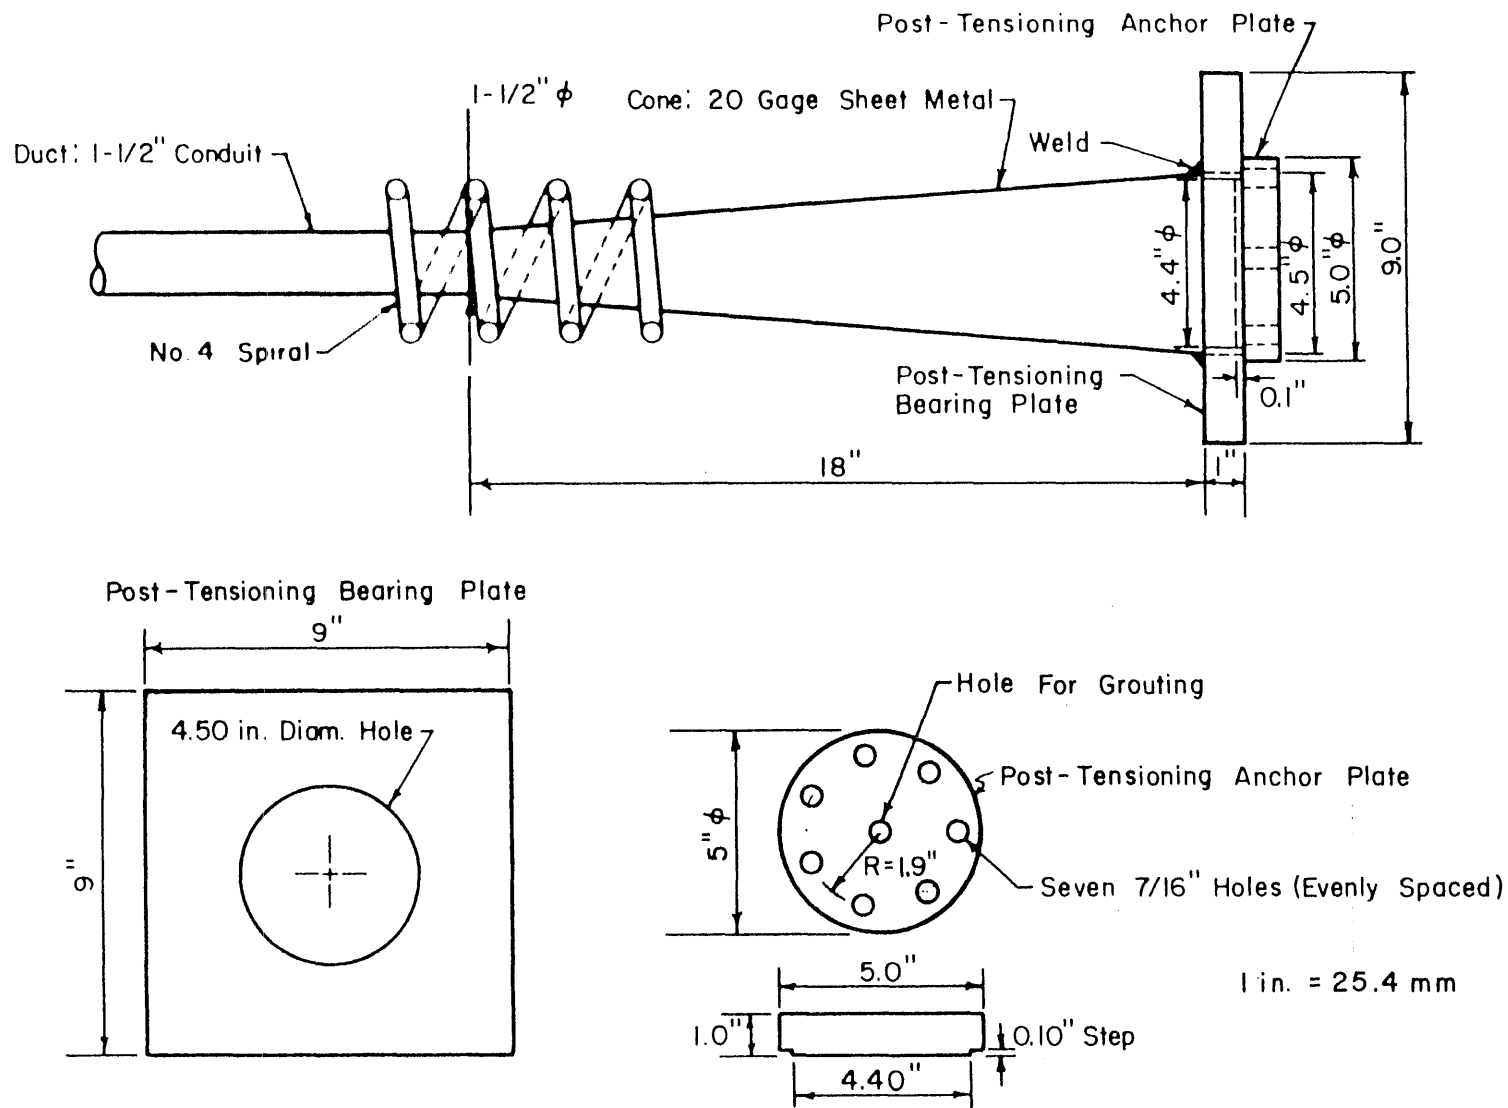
DETAILS OF POST-TENSIONING ANCHOR PLATES AND DUCT TRANSITIONS
